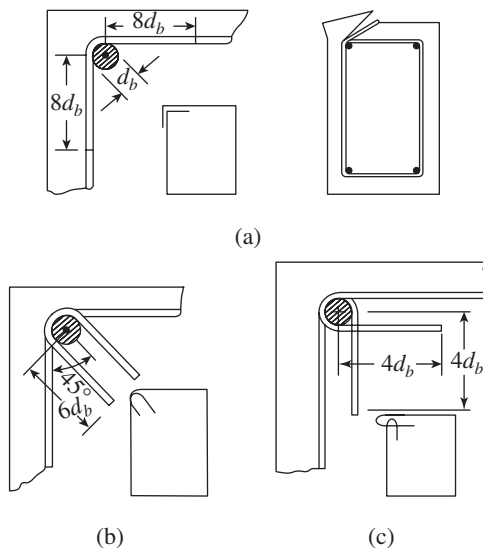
Anchoring stirrups (a) With 90° hook (b) With 135° hook (c) With 180° hook
